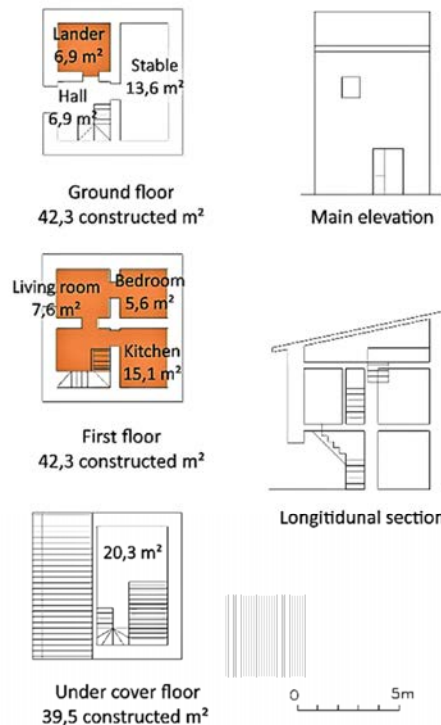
Construction typology data sheet of a dwelling in El Valle.
